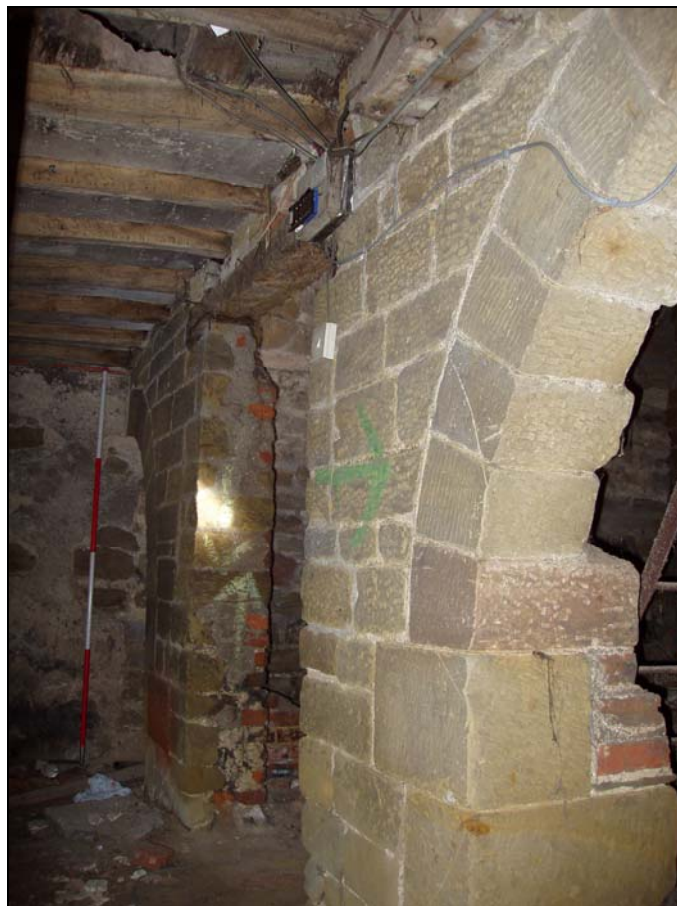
, 109: detail of the southern arched opening [10], from the southwest
